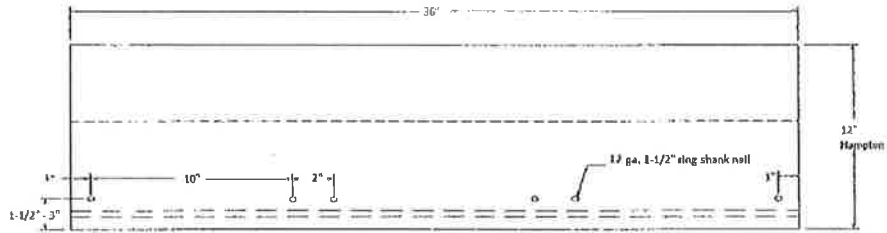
StormMaster® Slate 4 Nail Pattern
